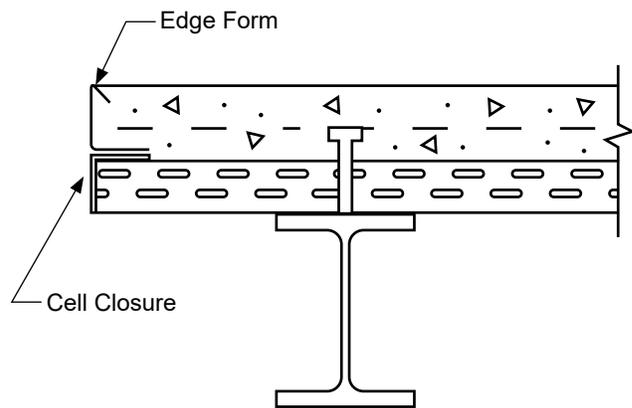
TWO PIECE EDGE FORM WITH DECK CANTILEVER ON WIDE FLANGE BEAM
